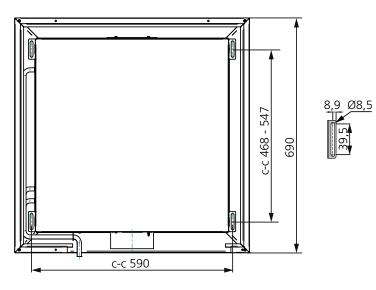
PARASOL EX 690 top view with air connection on side 2.
